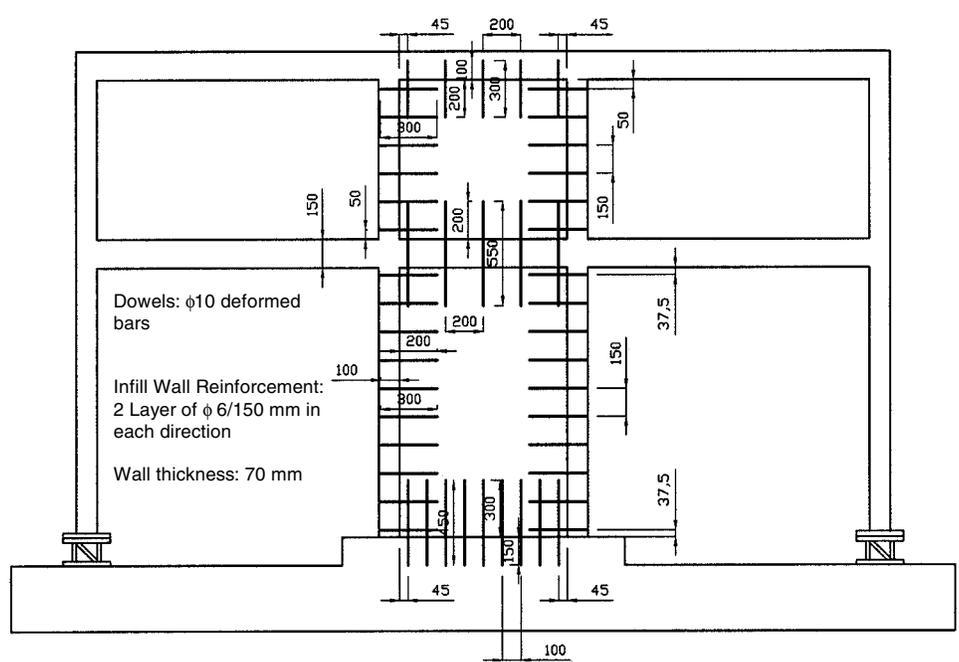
Steel Anchor Dowels (All dimensions are in mm)
